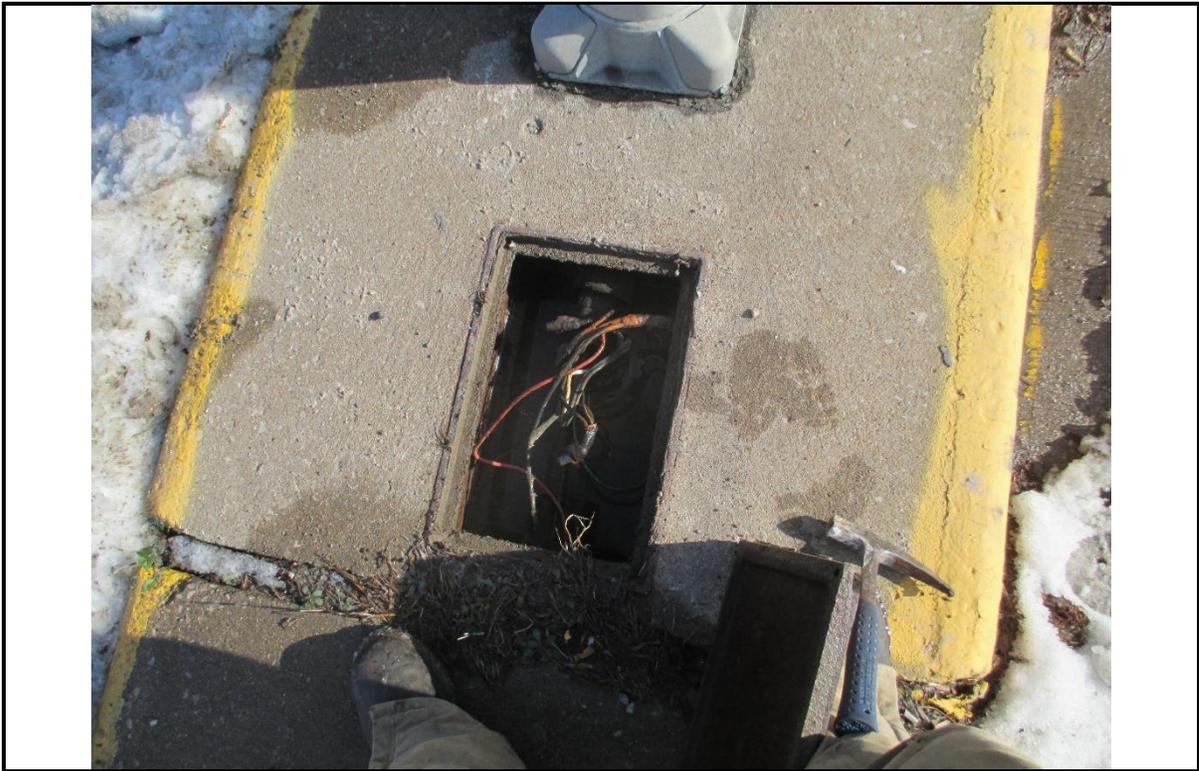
Photo showing chip location #1, and wiring inside of light post.
